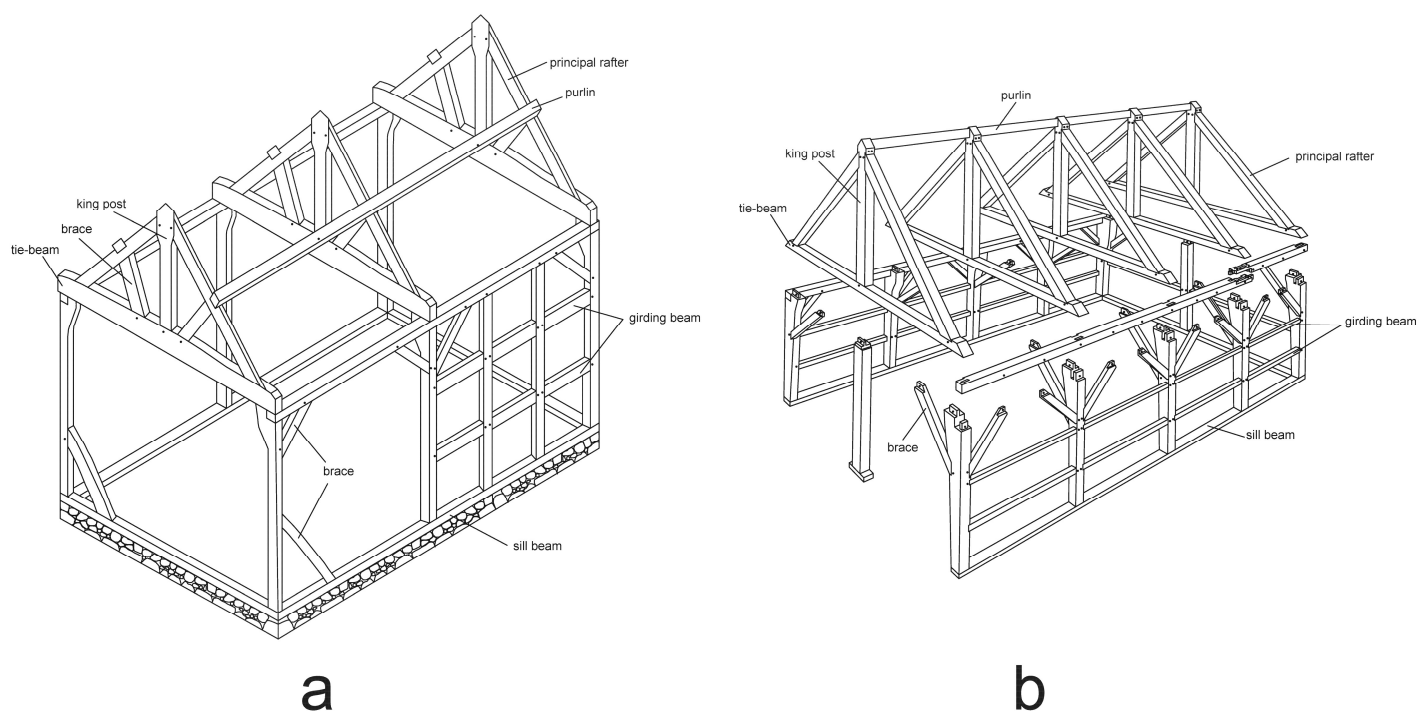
5. Posts off ground, post-and-truss construction, lateral bracing, diagonal braces, and complex jointing: (a) Box-frame building (adapted from Brunskill 1992, figs 48*d* and 48*f*); (b) Timber-framed barn built with squared timbers (adapted from Sobon and Schroeder 1984, 170).
